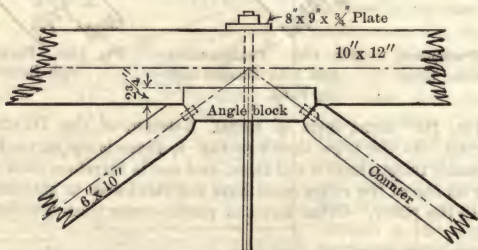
Alternate Detail of Joint 2, Fig. 3
